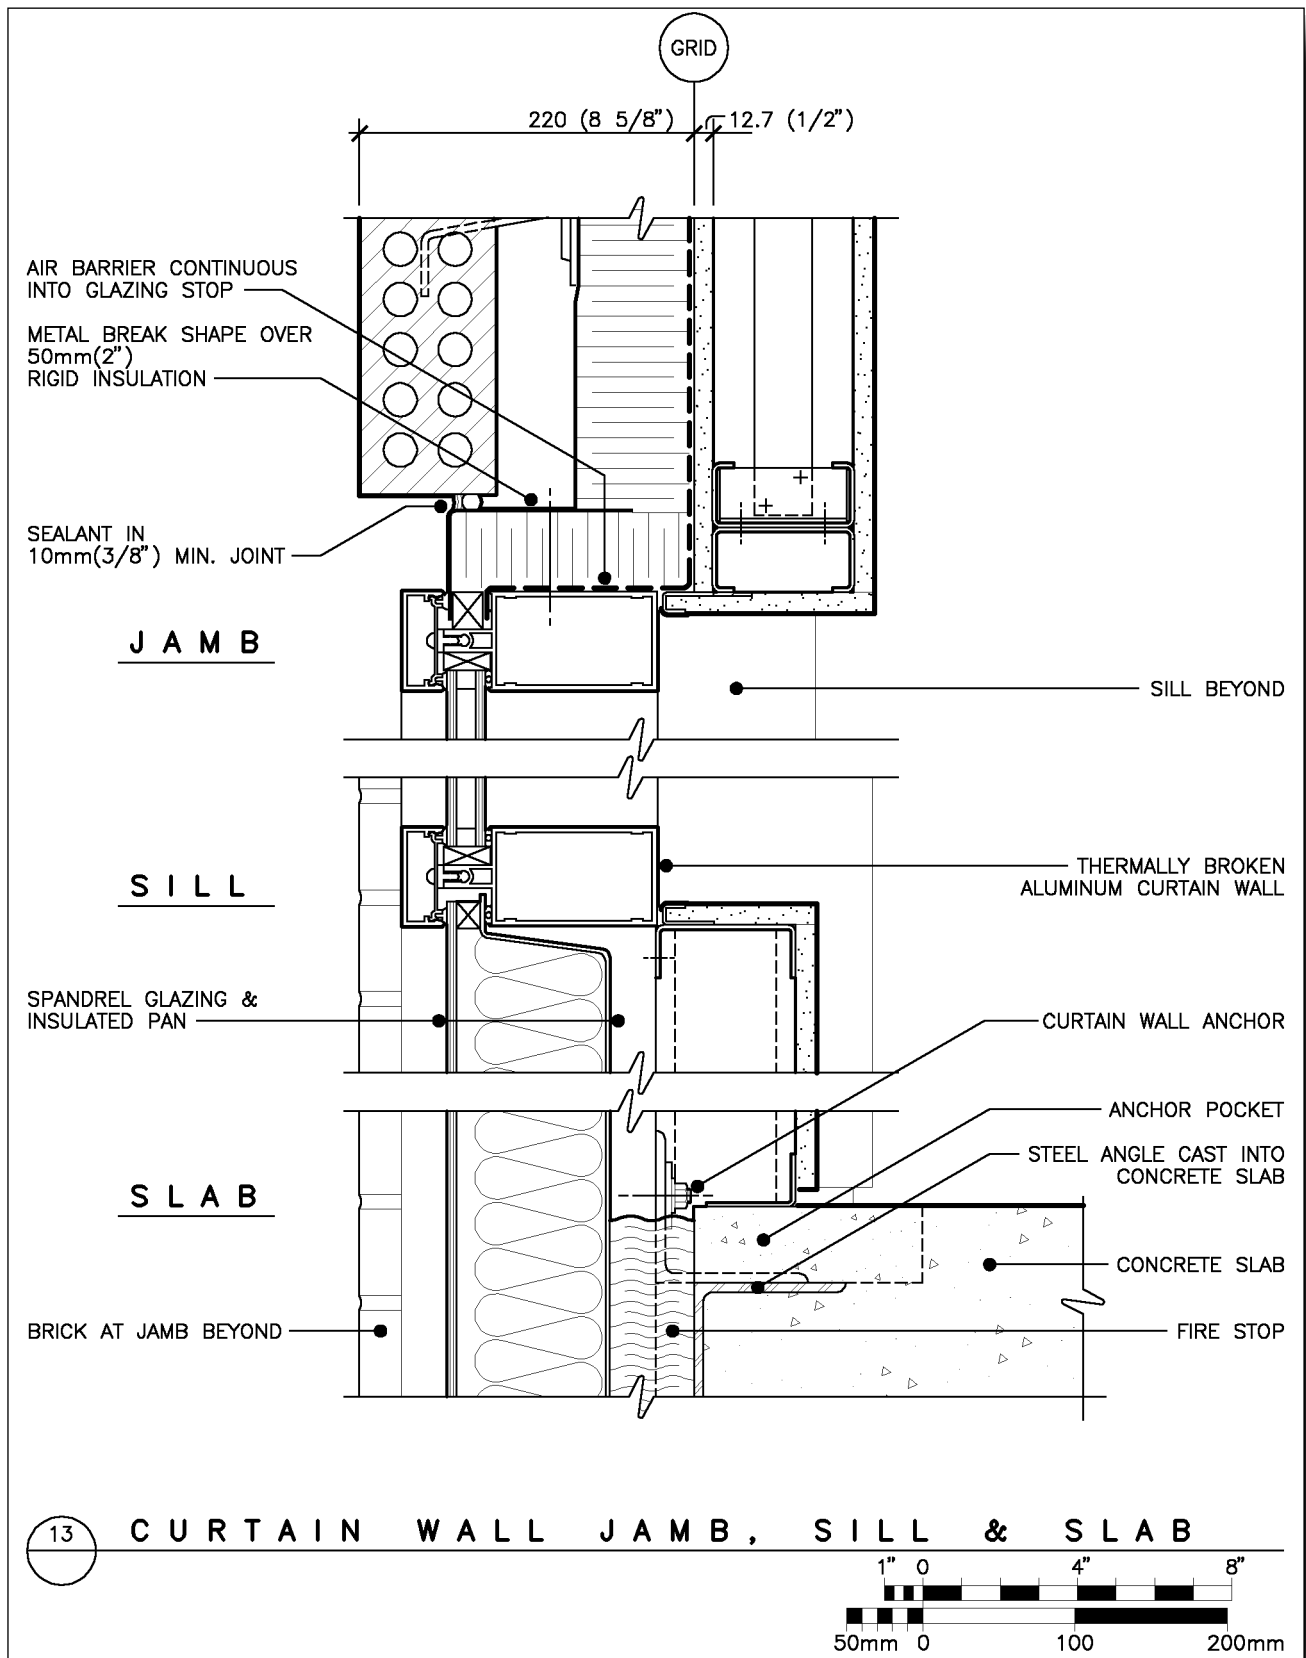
CURTAIN WALL JAMB, SILL AND SLAB
